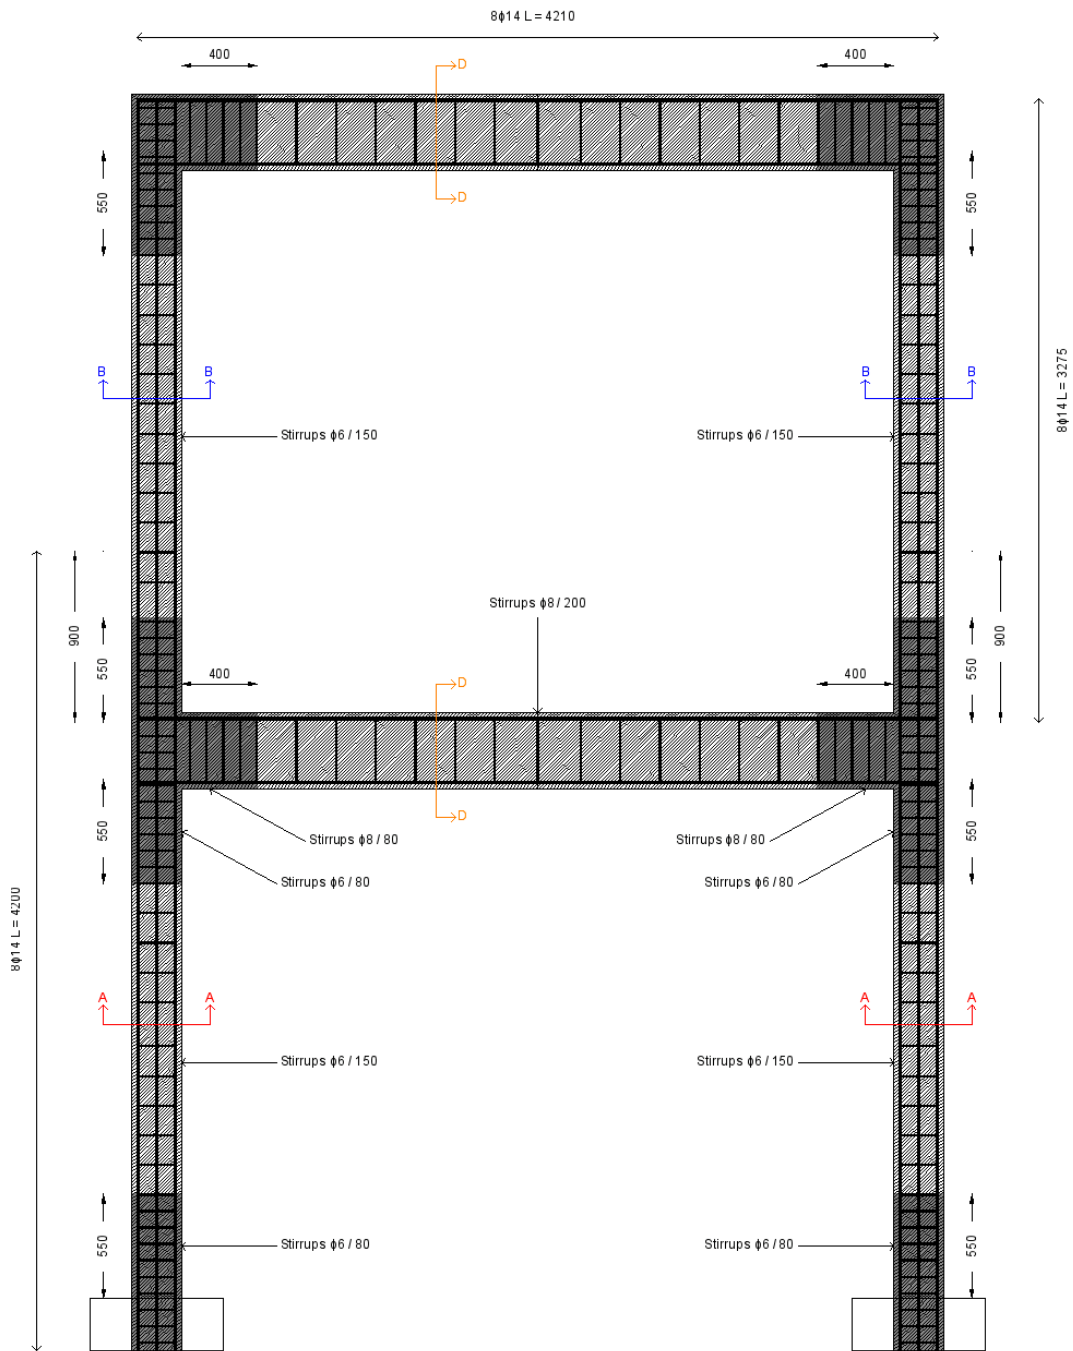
Longitudinal and transversal reinforcement in the frame (beams 400 · 260)
